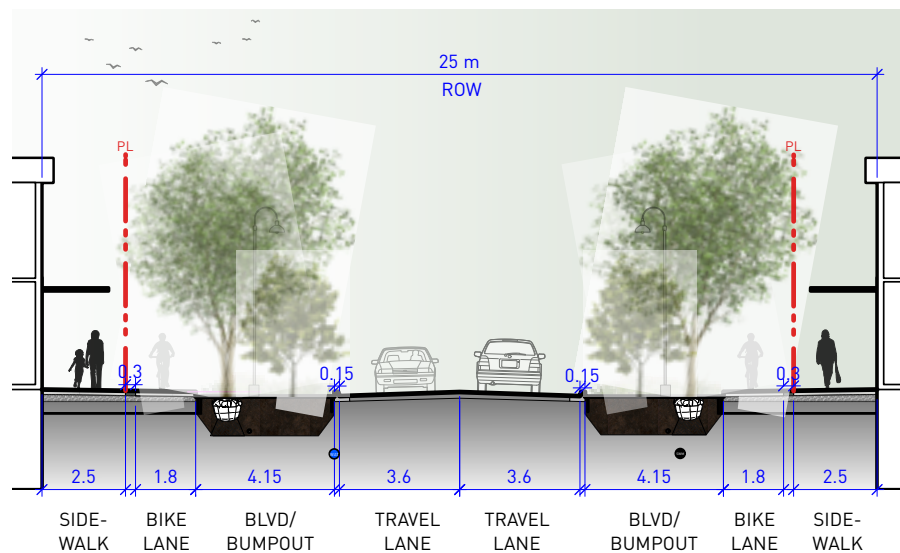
SECTION 1 - TYPICAL STREETSCAPE
